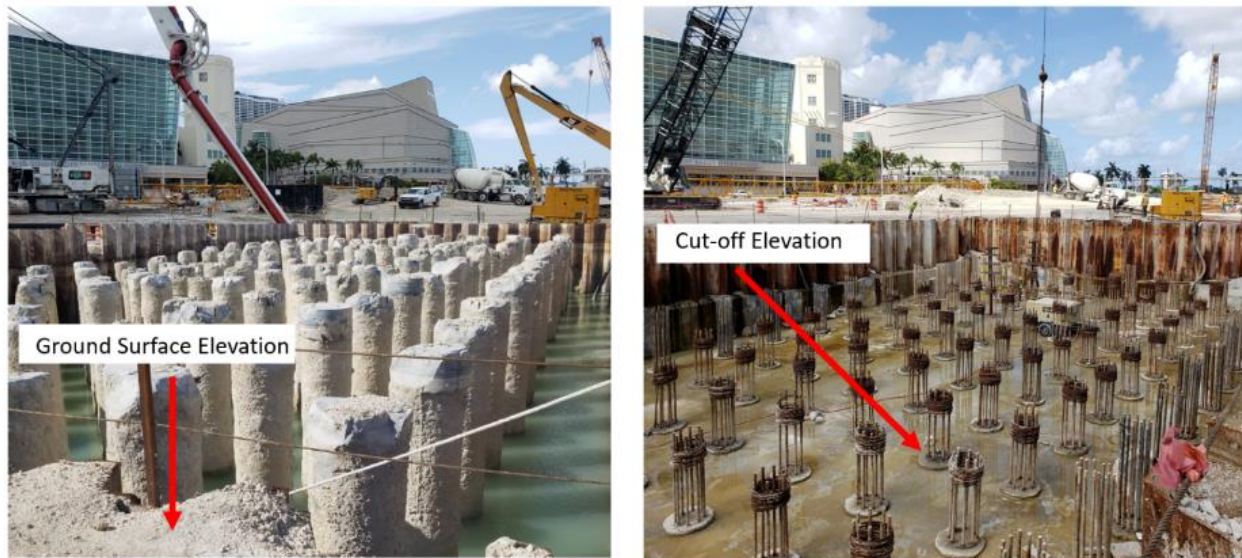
Fill excavated around a pile group for pile cap construction (left) and piles cut off exposing reinforcing steel (right)
